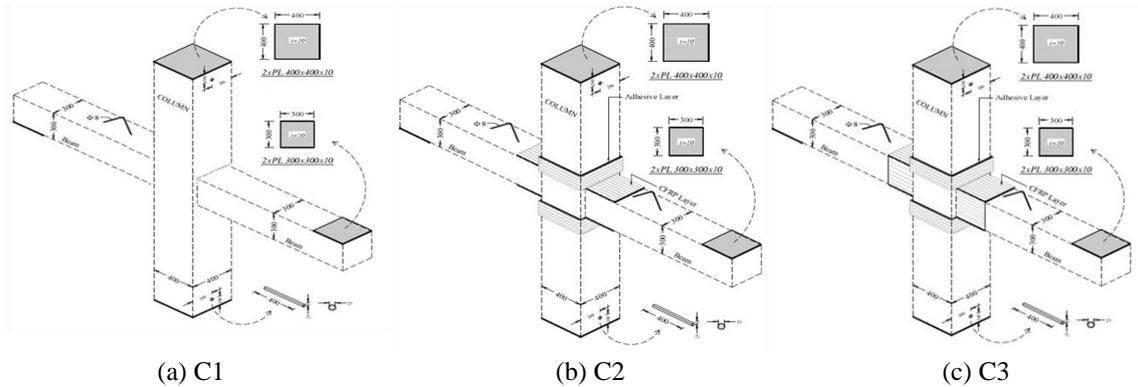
Three interior beam-column connection: (a) Normal Ductility-C1, (b) Partial Wrapping CFRP-C2 and (c) Full Wrapping CFRP-C3
